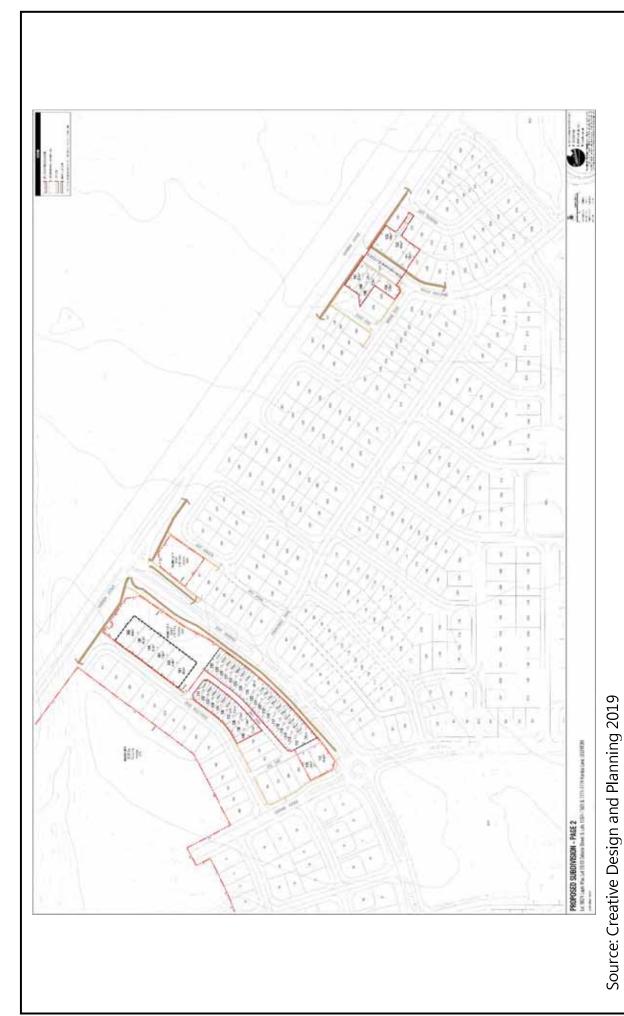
Subdivision plan (Stages 7A, 7B, 13A and 20C)
